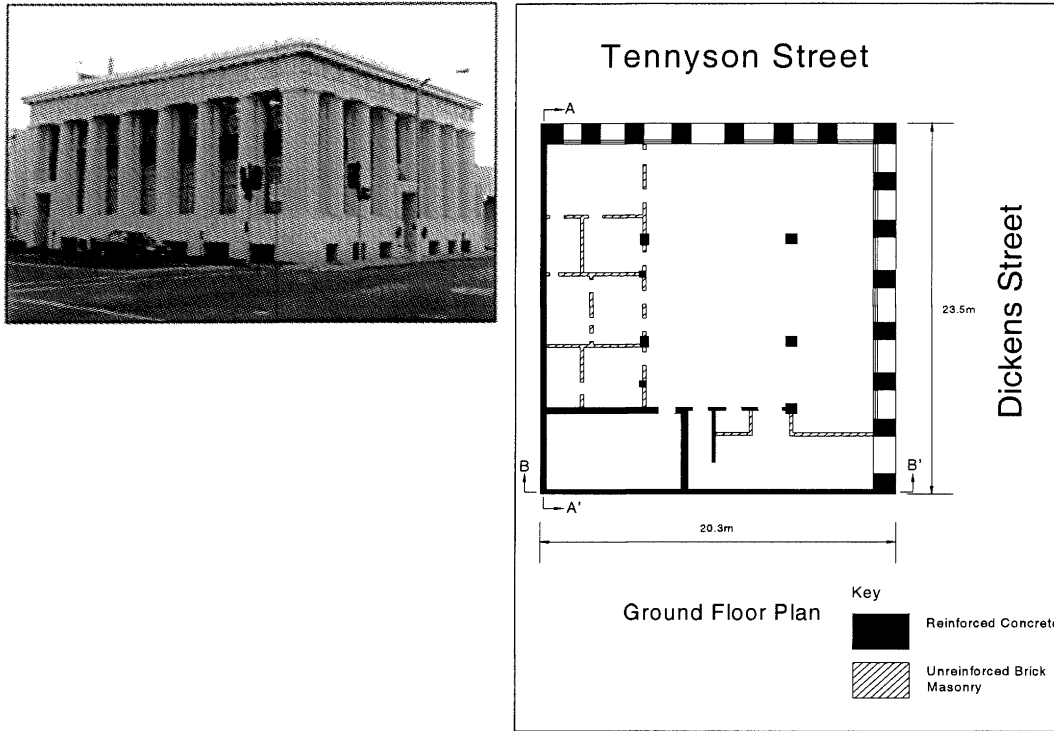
Public Trust Office, Napier, with perimeter walls on two adjacent facades, making it an asymmetric “corner” building.
